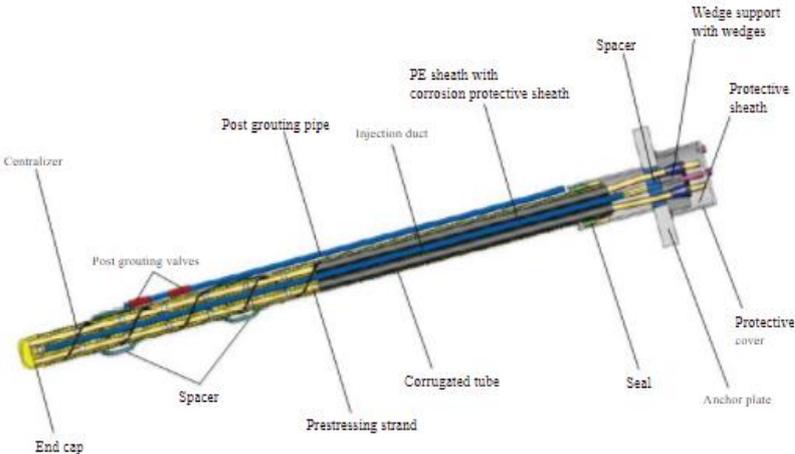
Permanent ground anchor (<http://www.bauerfoundations.com/en/competences/anker.html>)
